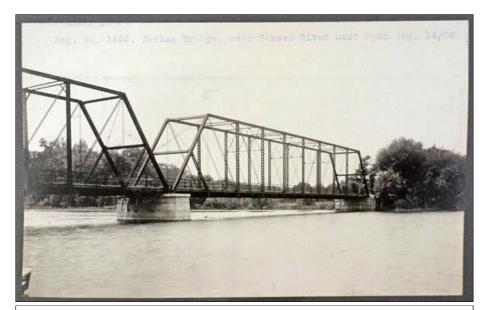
Jordan Steel Truss Bridge over the Seneca River at present day Quimby's Landing. Text at top of image "Neg. No. 1555. Jordan Bridge, over Seneca River west span Aug. 14/06." ⁶⁹
